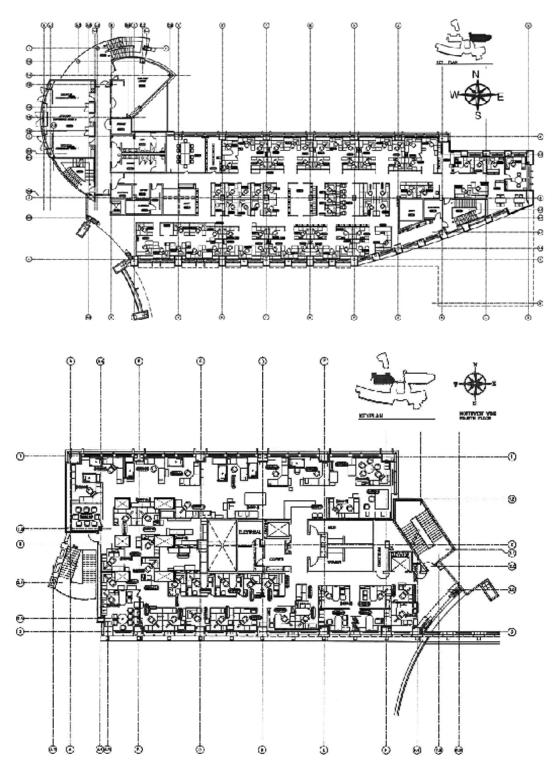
Plans for 2nd floor NE wing and 4th floor NW wing of CSC building
